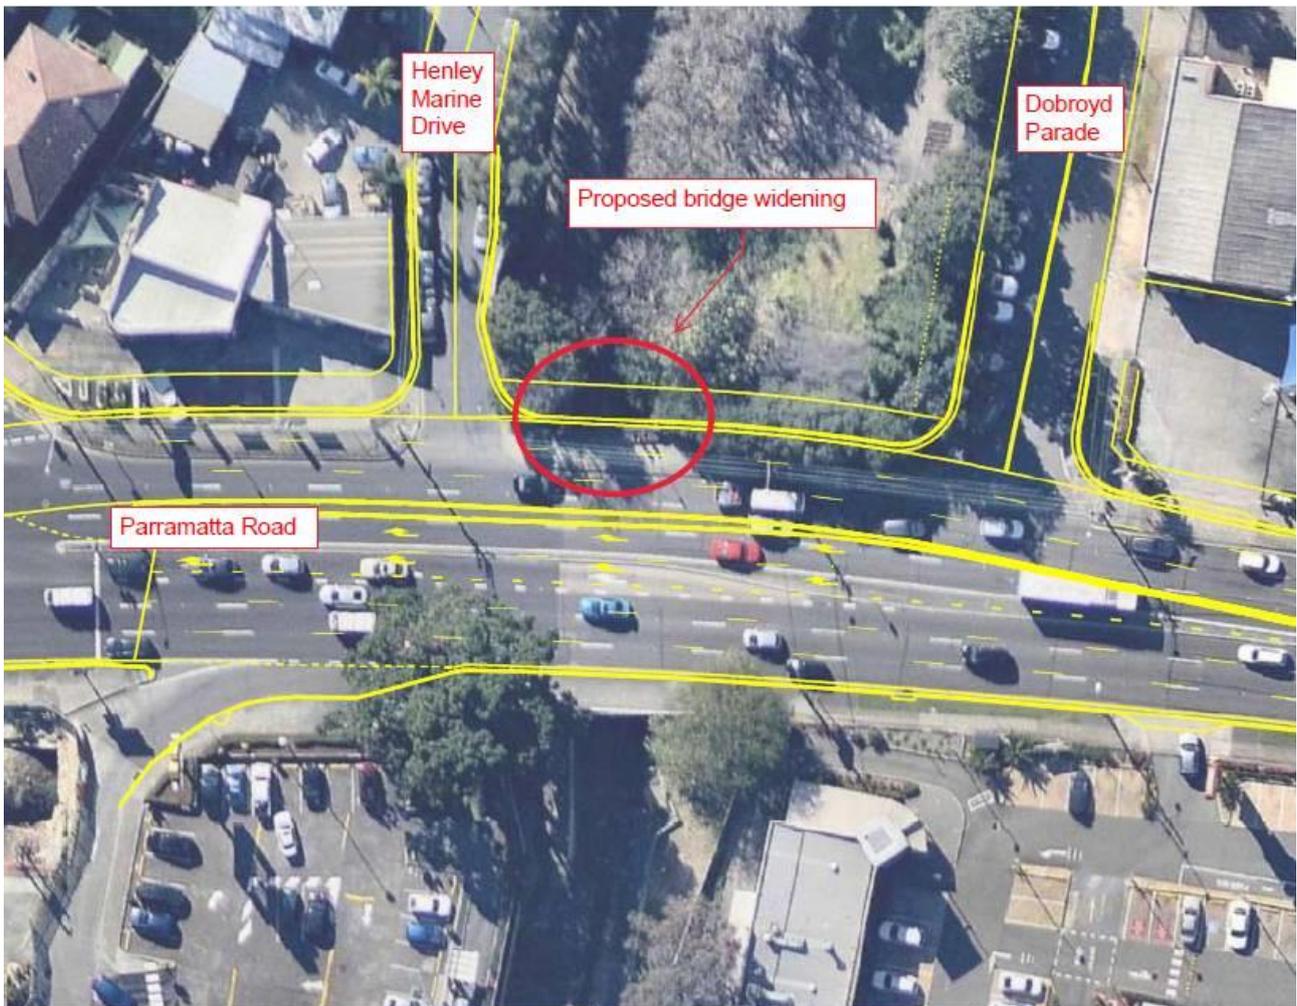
Plan view showing the proposed Iron Cove Creek bridge widening on Parramatta Road at the intersection with Henley Marine Drive (VBA 2016)
